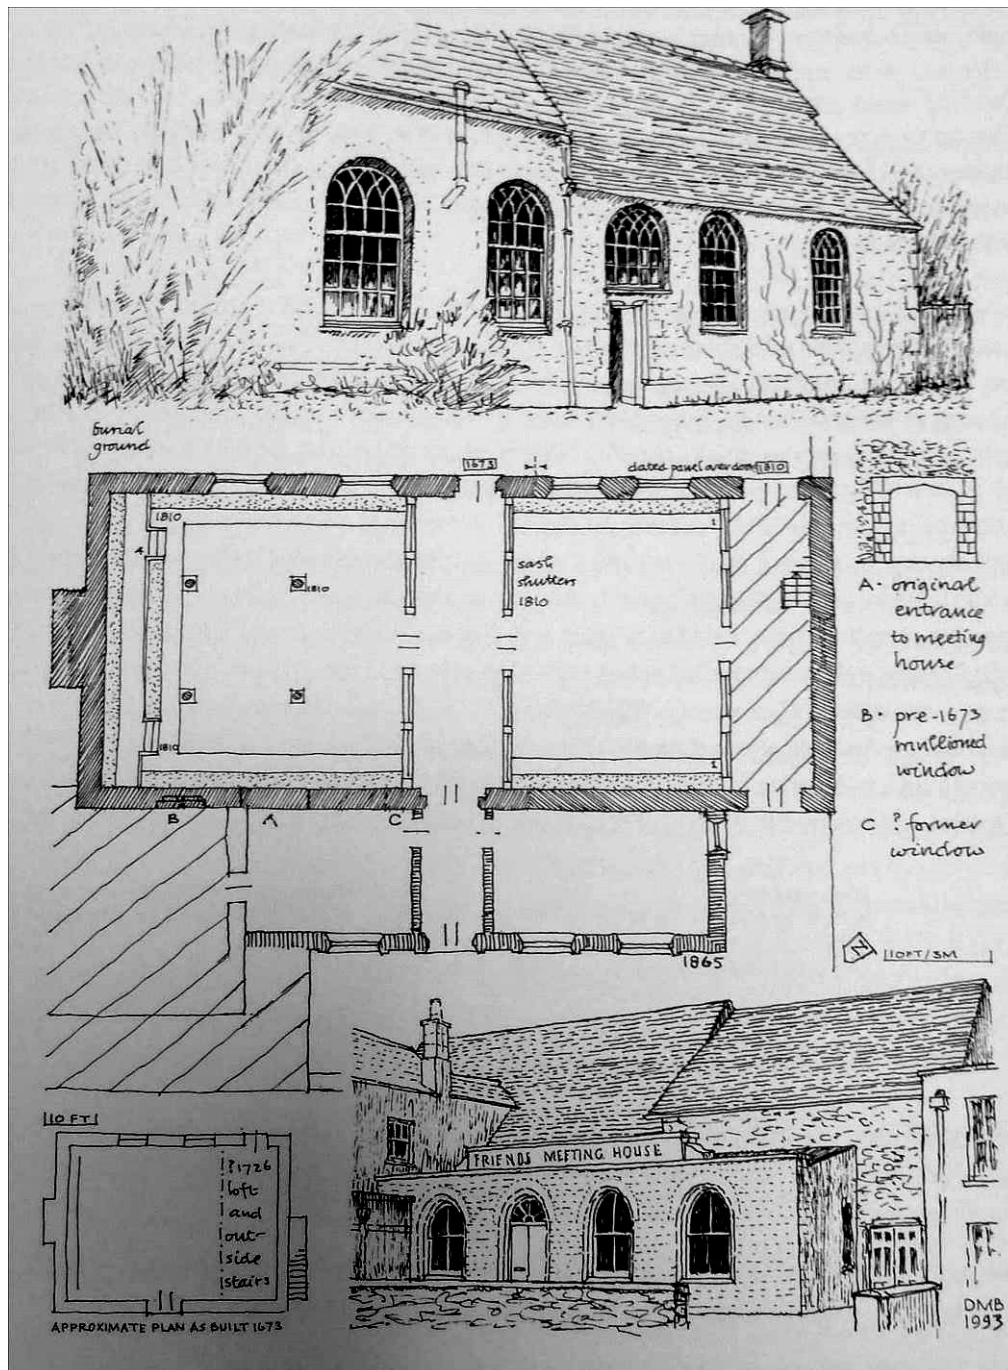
Plan, elevations and details, from Butler, vol. 1, p.213
